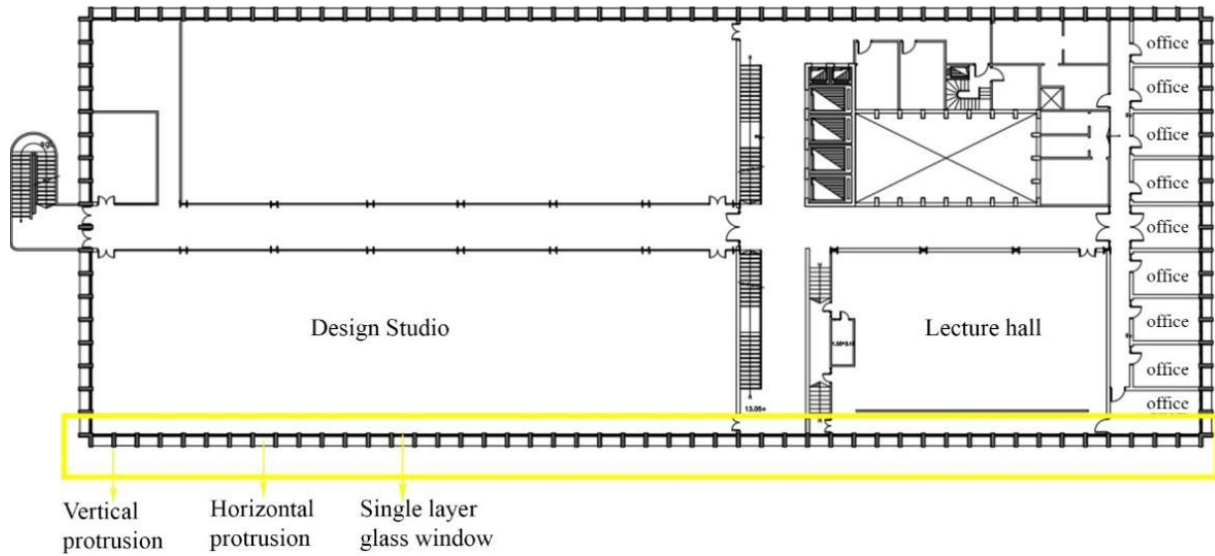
Architectural floor plan for the typical floor, which corresponds to the 3rd floor
